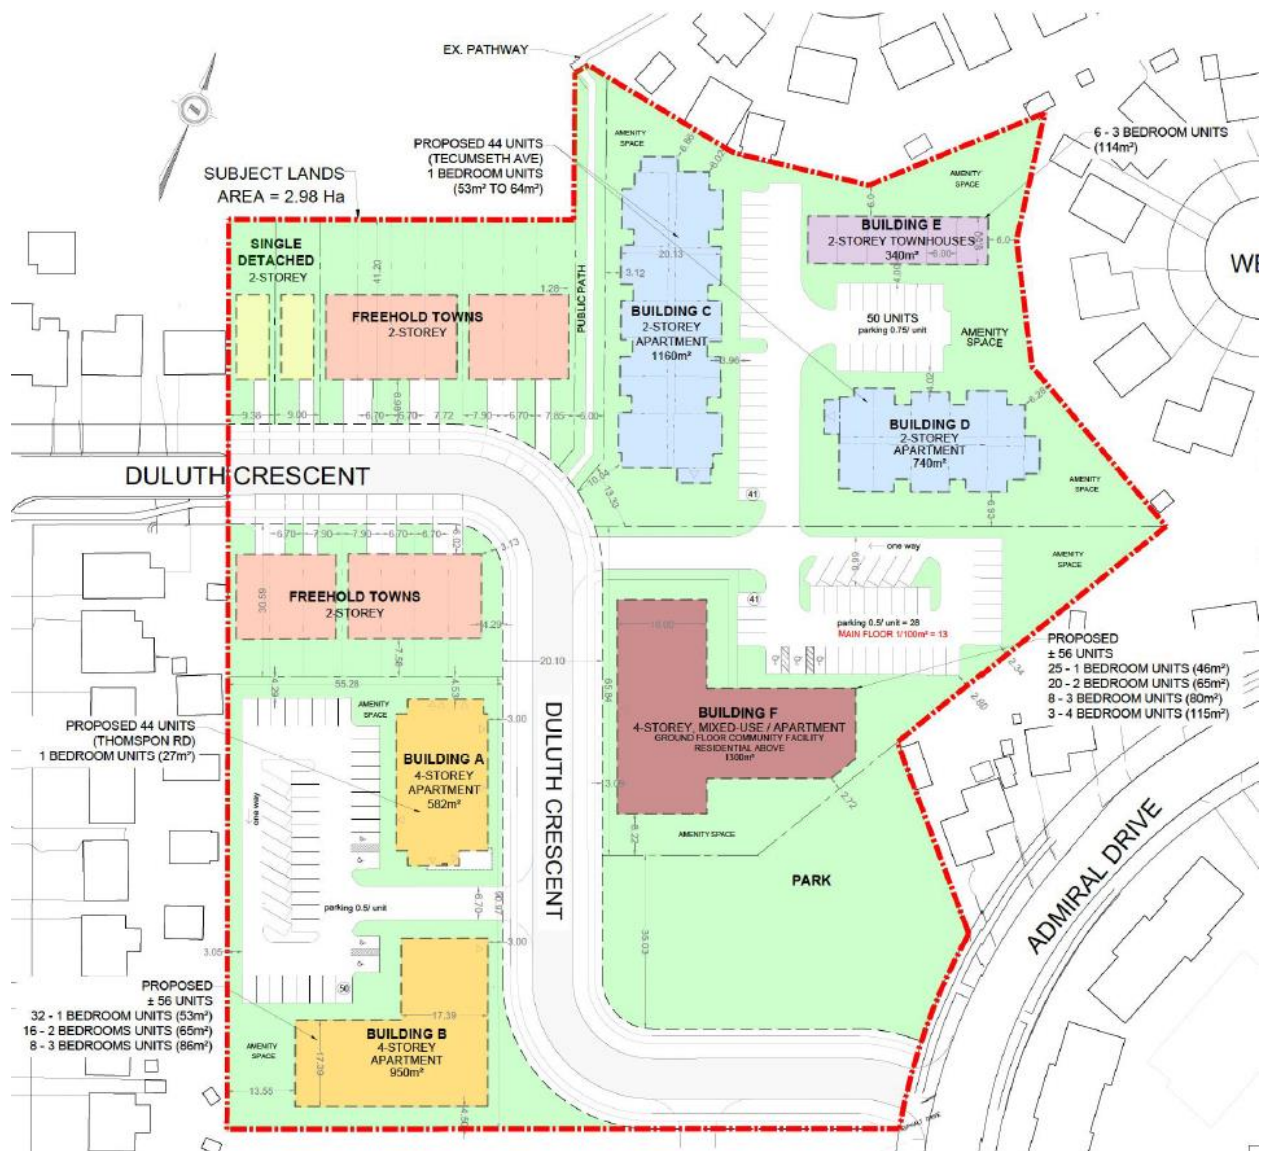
Conceptual Site Plan (Monteith Brown Planning Consultants, 2023)
